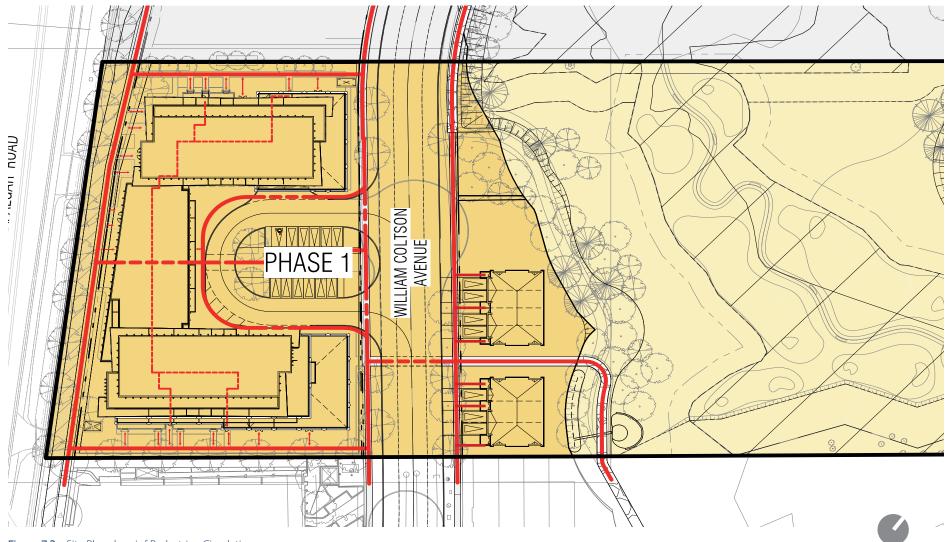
Site Plan showinf Pedestrian Circulation
